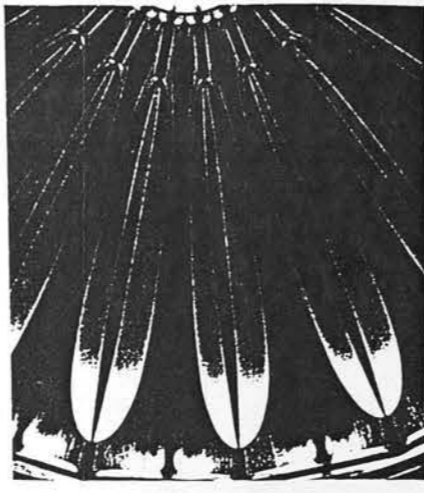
B FOLDED SECTIONS PROVIDE RIGIDITY, (WOHLEN SCHOOL HALL)
